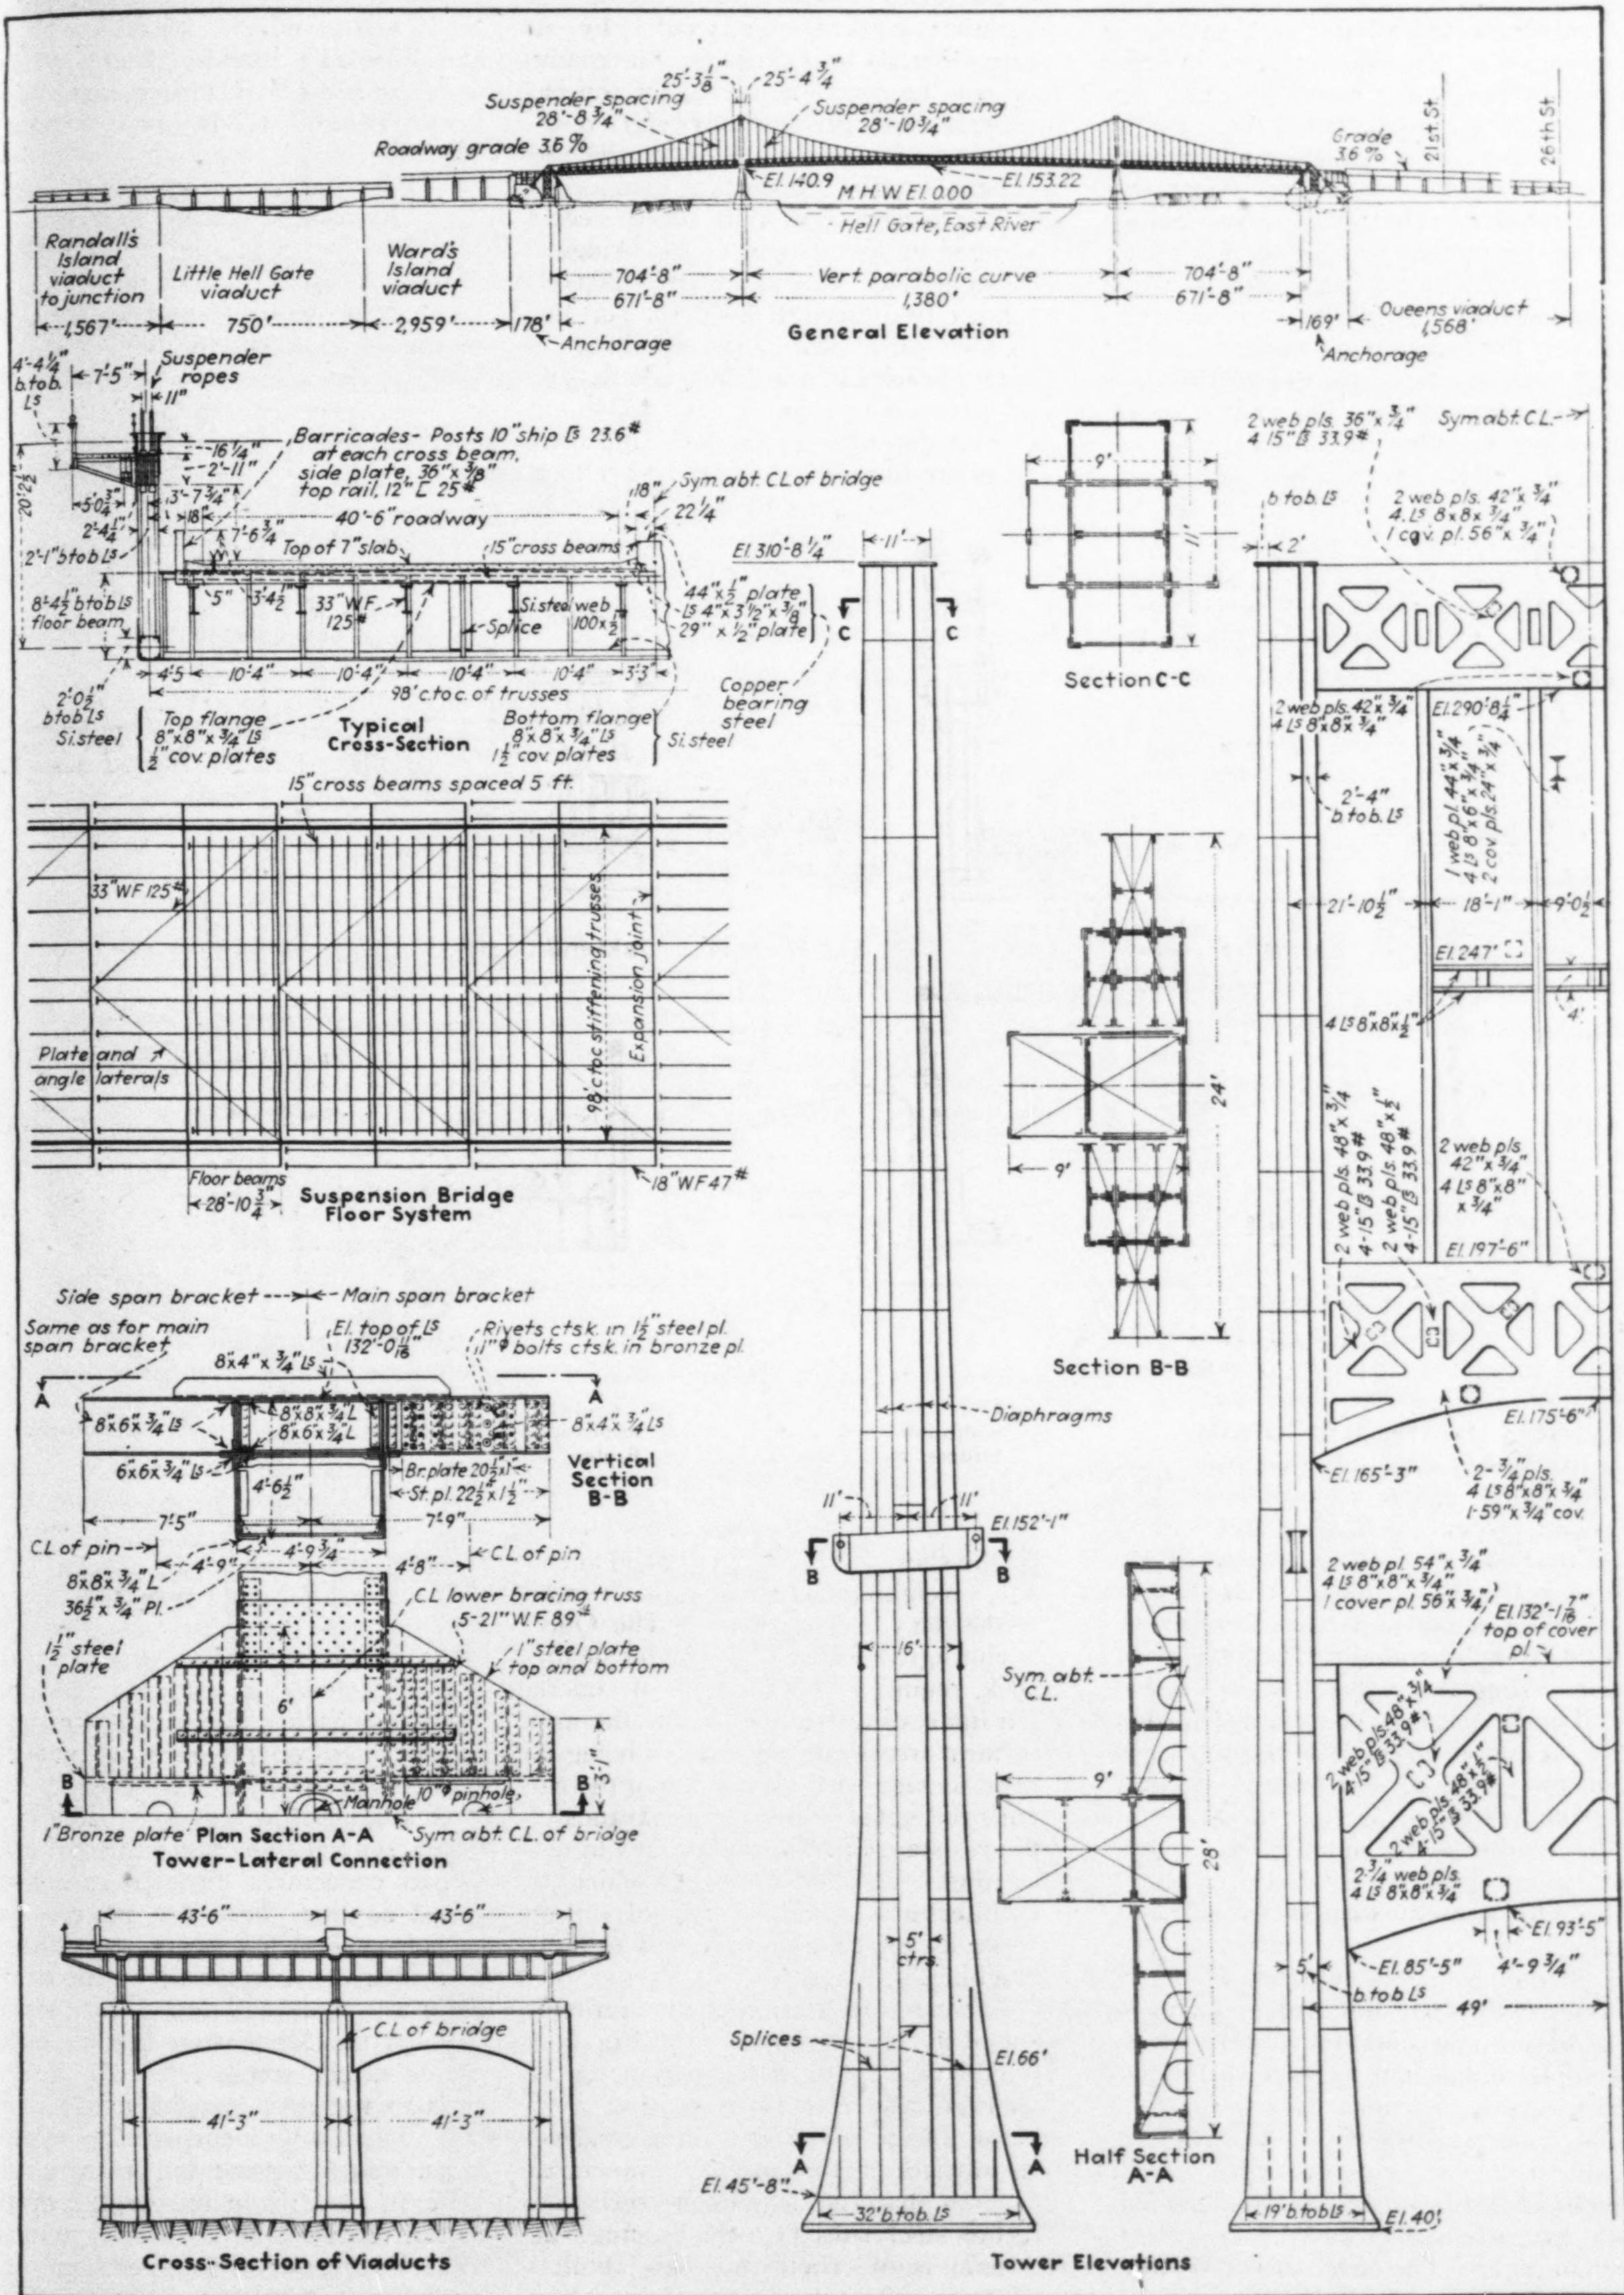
STRUCTURAL DETAILS OF TRIBOROUGH BRIDGE IN NEW YORK.
